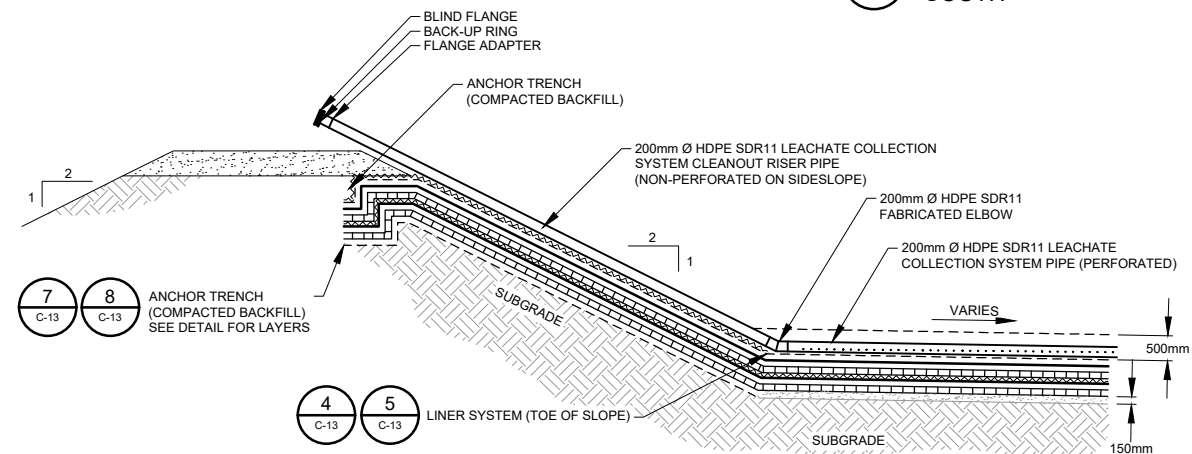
LEACHATE COLLECTION SYSTEM TOE DRAIN / LEACHATE COLLECTION SYSTEM PIPE PERFORATIONS
